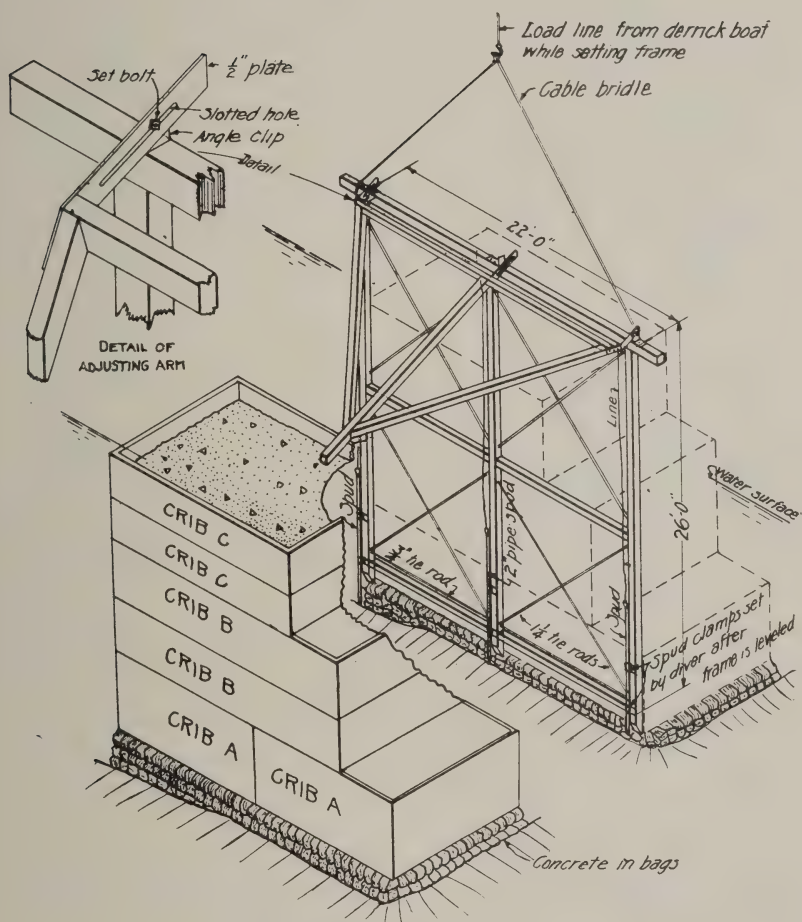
Isometric View of Crib Setting Frame, North Guide Wall, Troy Lock.
